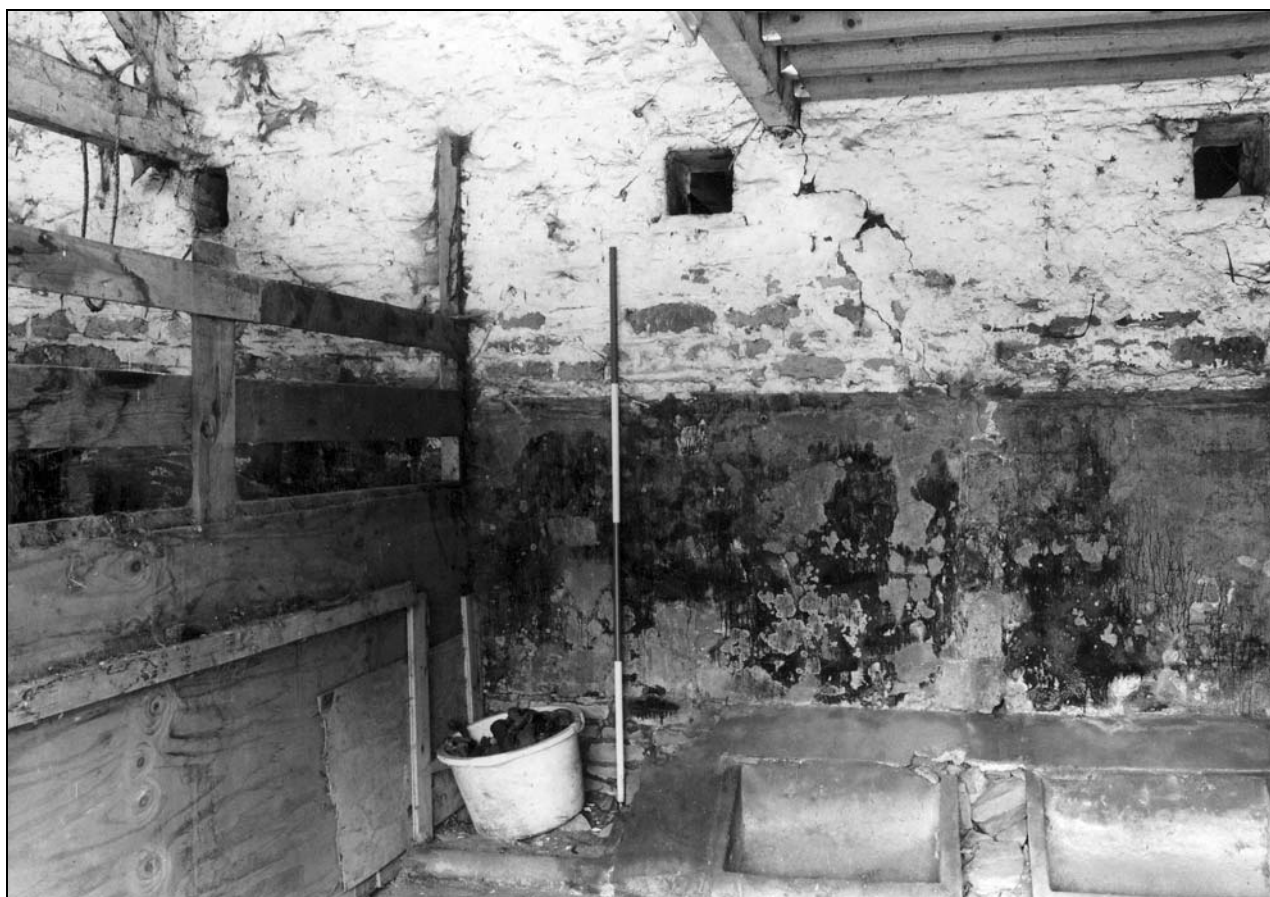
Building 1: cattle troughs in east ground floor room, from the east (film 2, frame 4)
